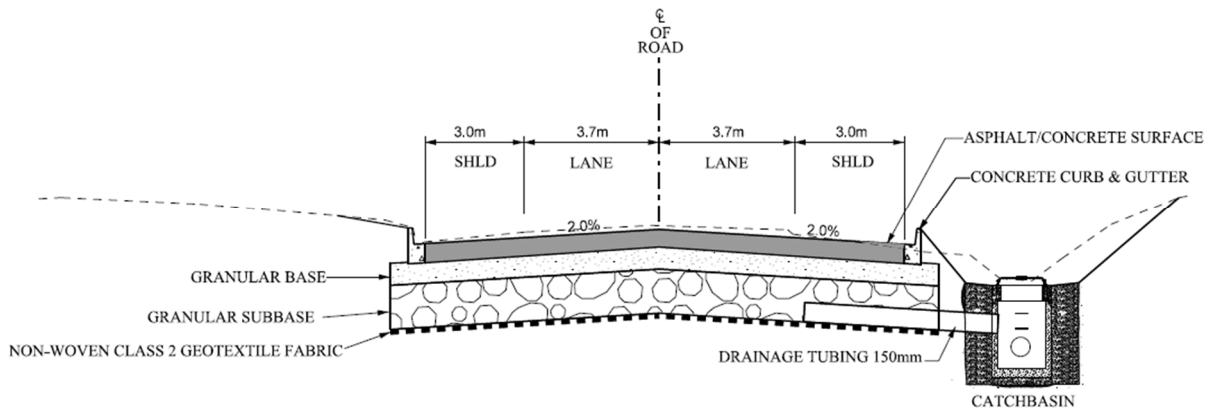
Typical x-Section and Subsurface French Drain Connected to Catch Basin at Urban Highways/Roads
